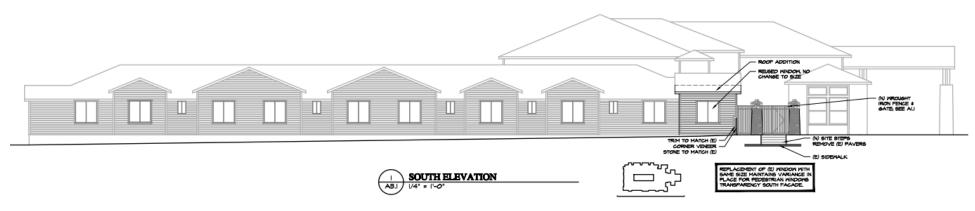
Proposed Modifications to South Elevation – Facing Amanda Court – (Not to Scale)
